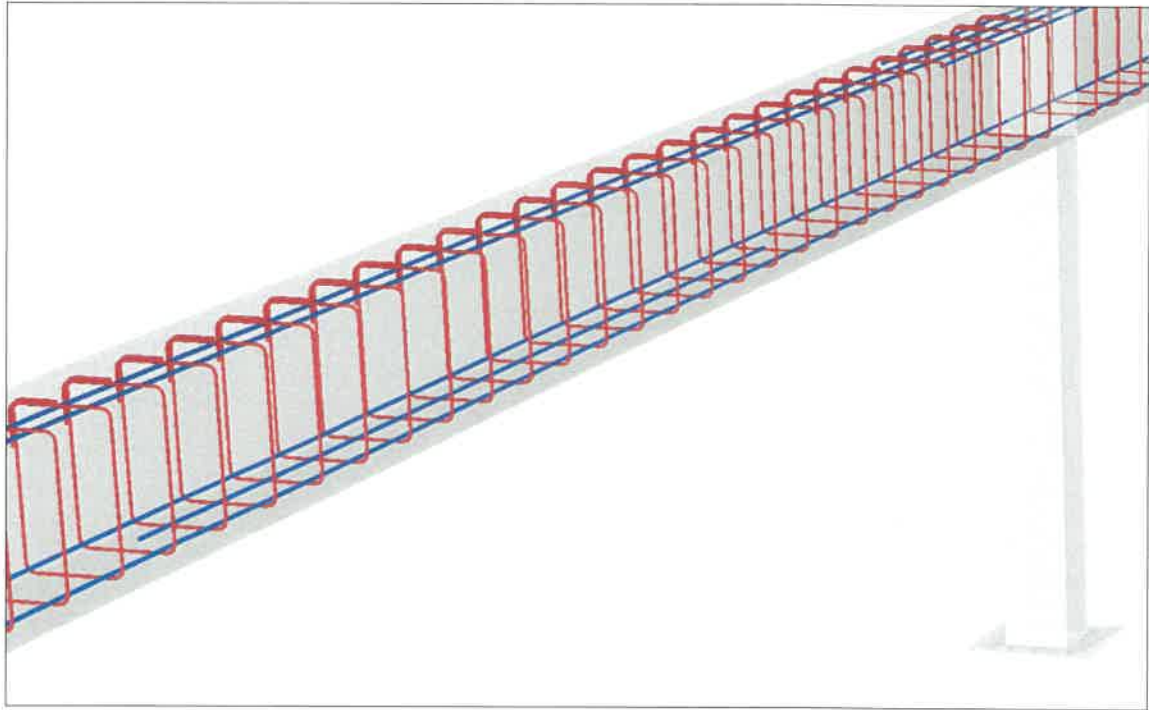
3D Model of a Reinforced Concrete Beam
